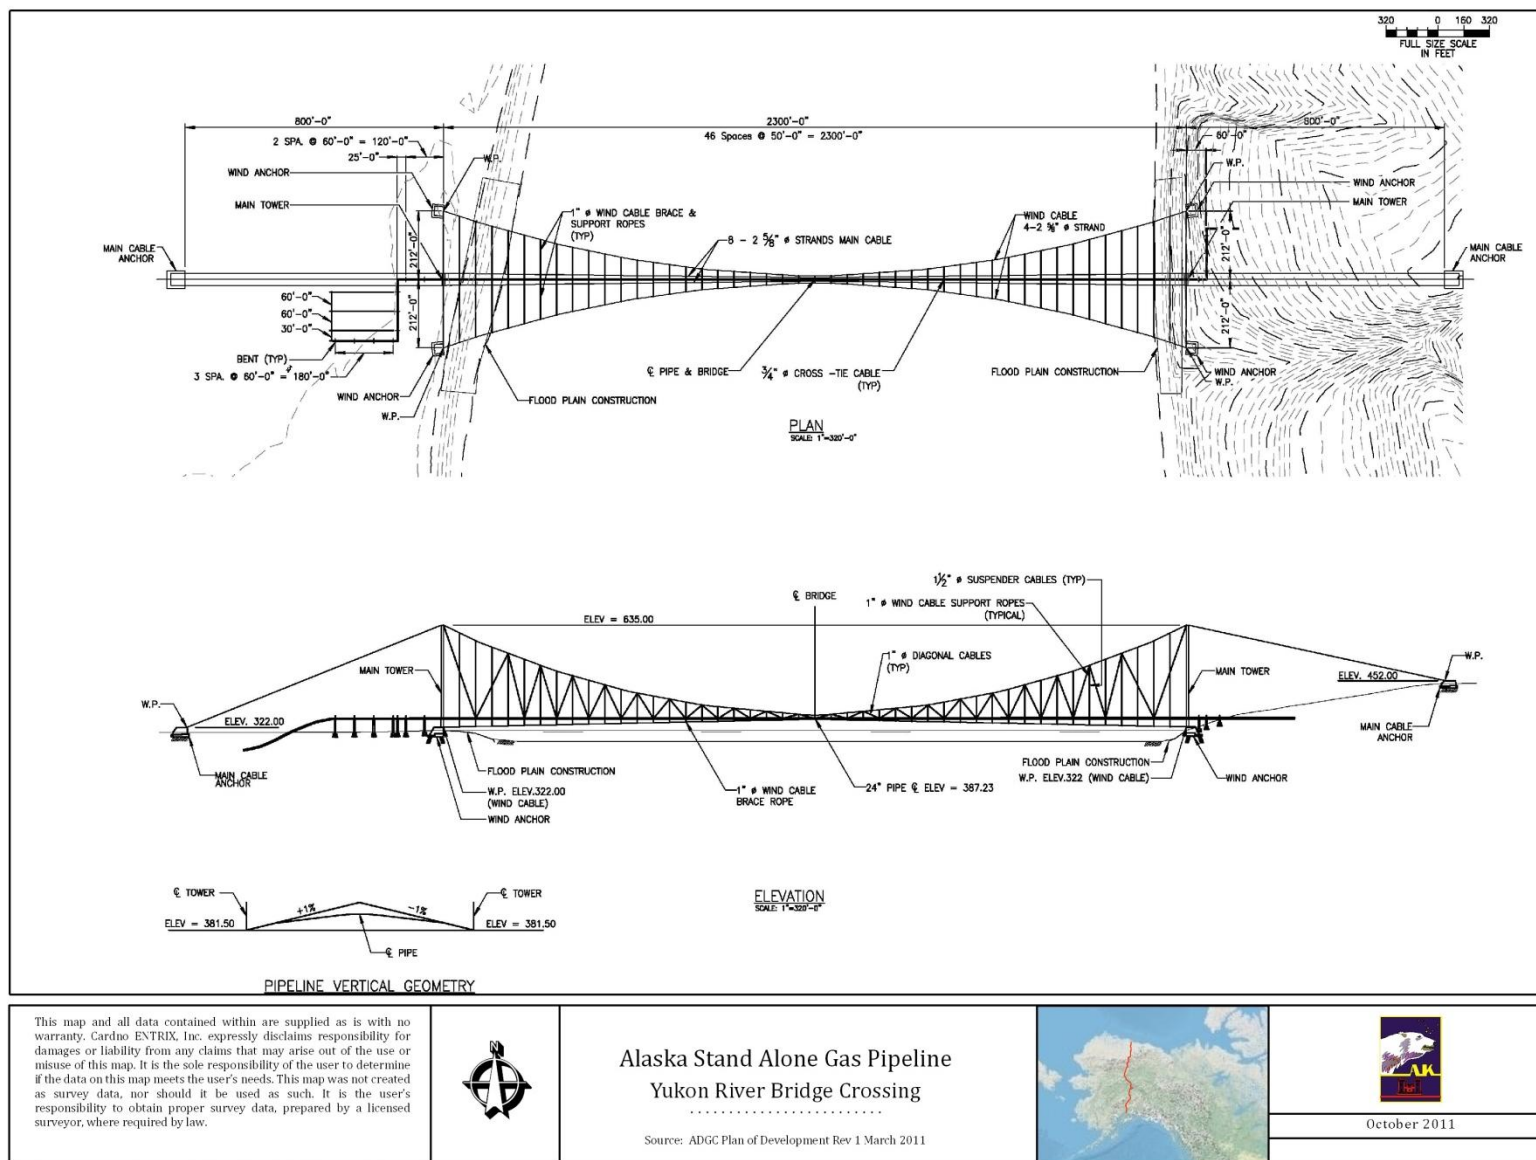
Yukon River New Bridge Crossing (Option 1)
